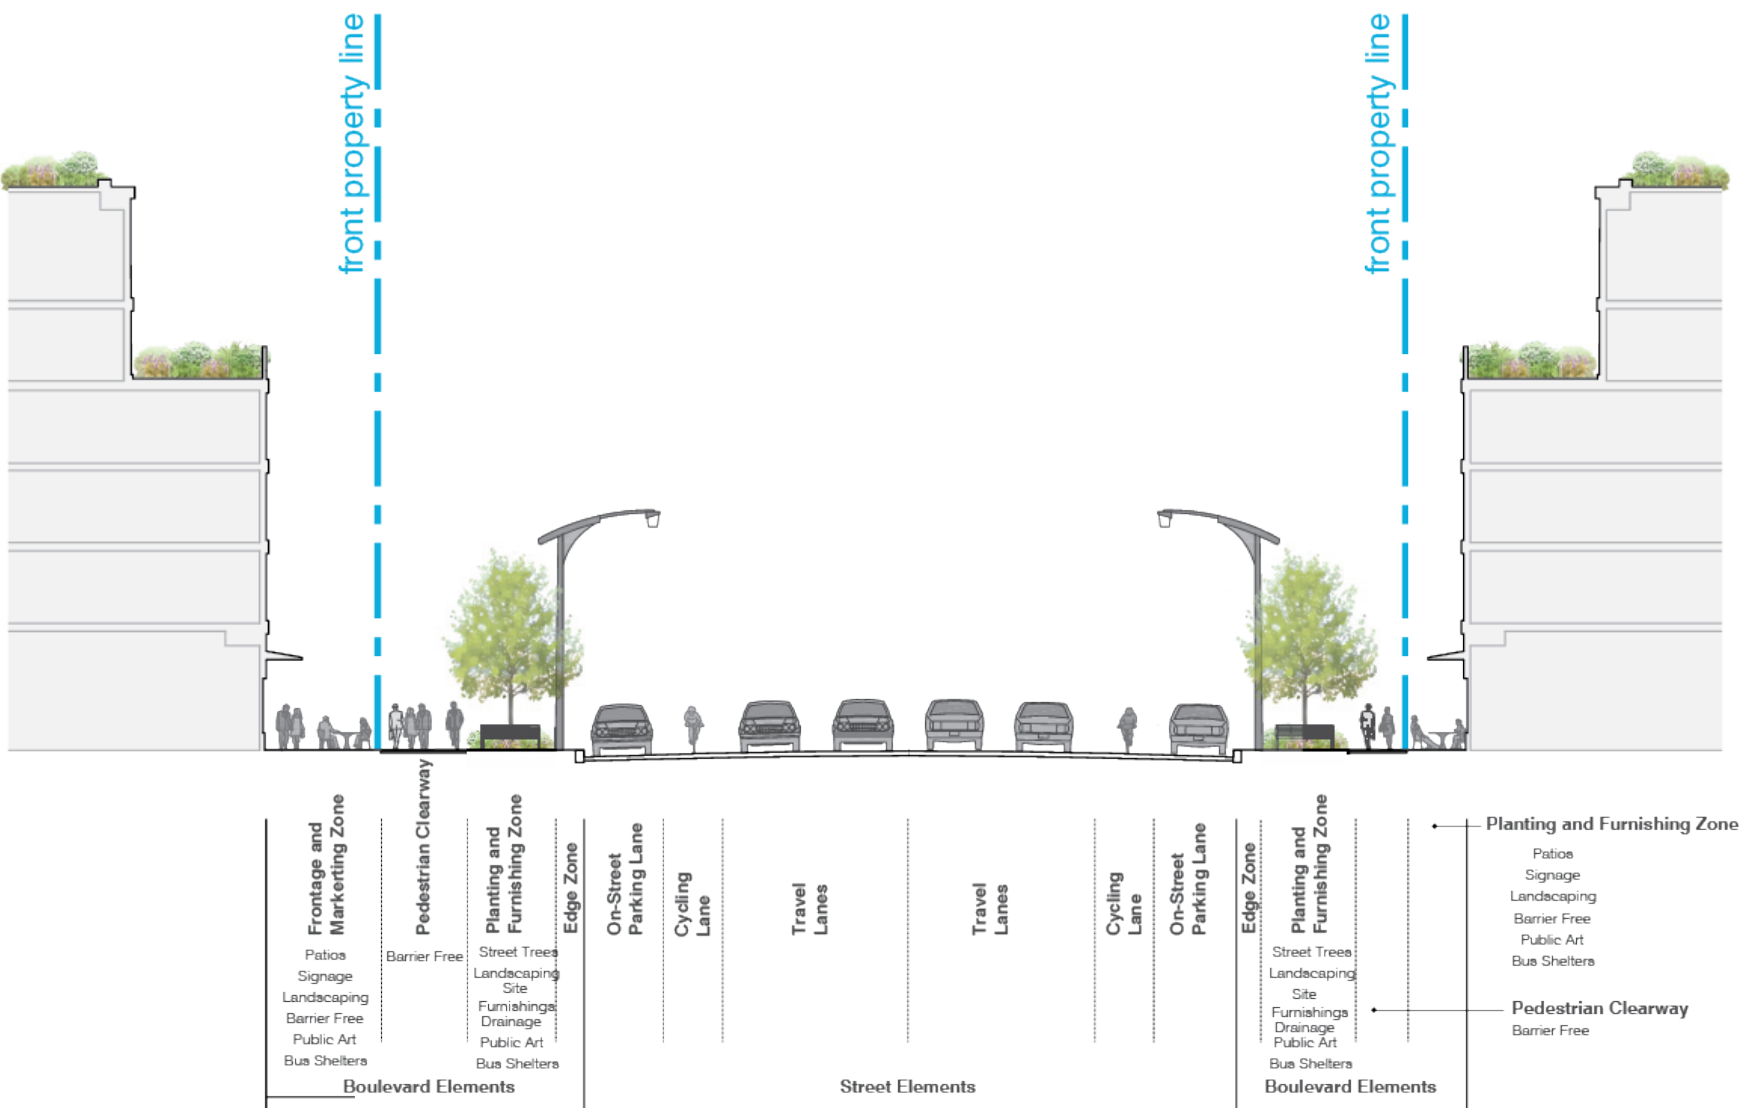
Example of typical street and boulevard elements within general right-of-way.
